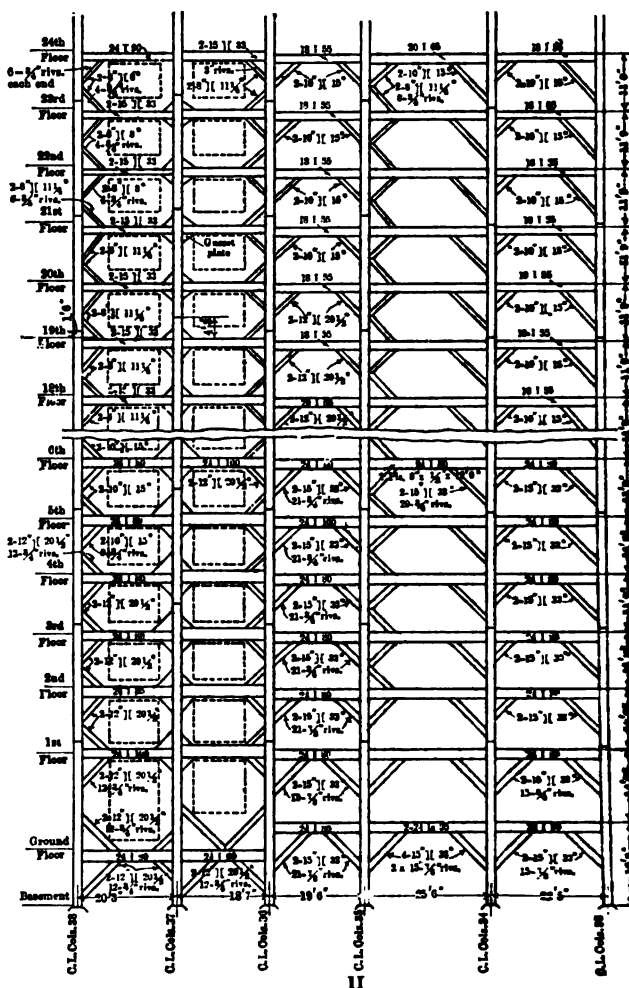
Whitehall Building. Wind-bracing on Line II, Fig. 10
